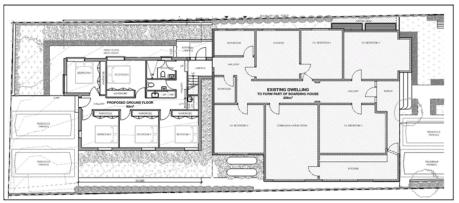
Ground floor plan existing dwelling and extension (Oramatis, 2020)
